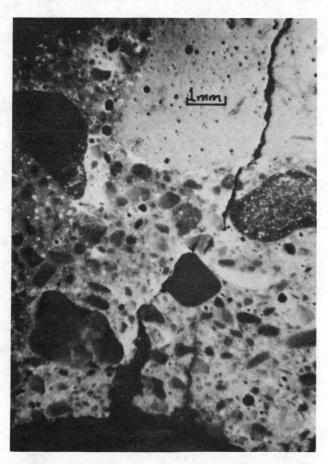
Core J, Bethlehem bridge rebar corrosion and associated vertical crack.
